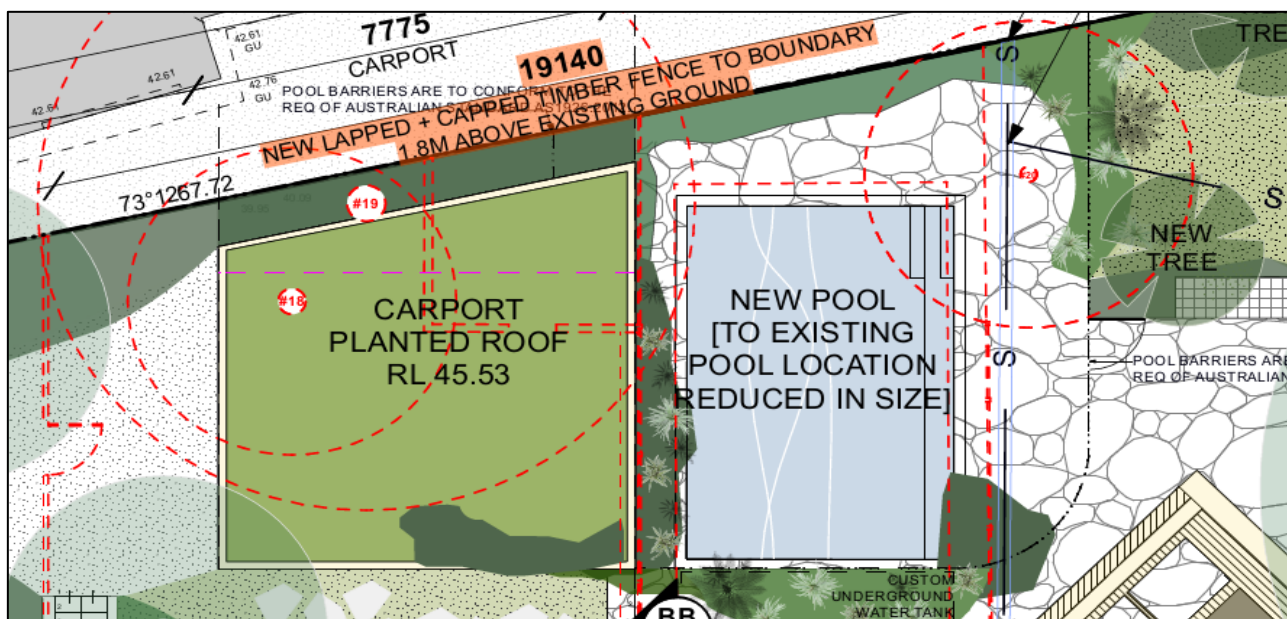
Extract of the applicant's submitted Roof Plan, detailing open garage planted roof and boundary fence details. Source: *(Some Commonplace)
